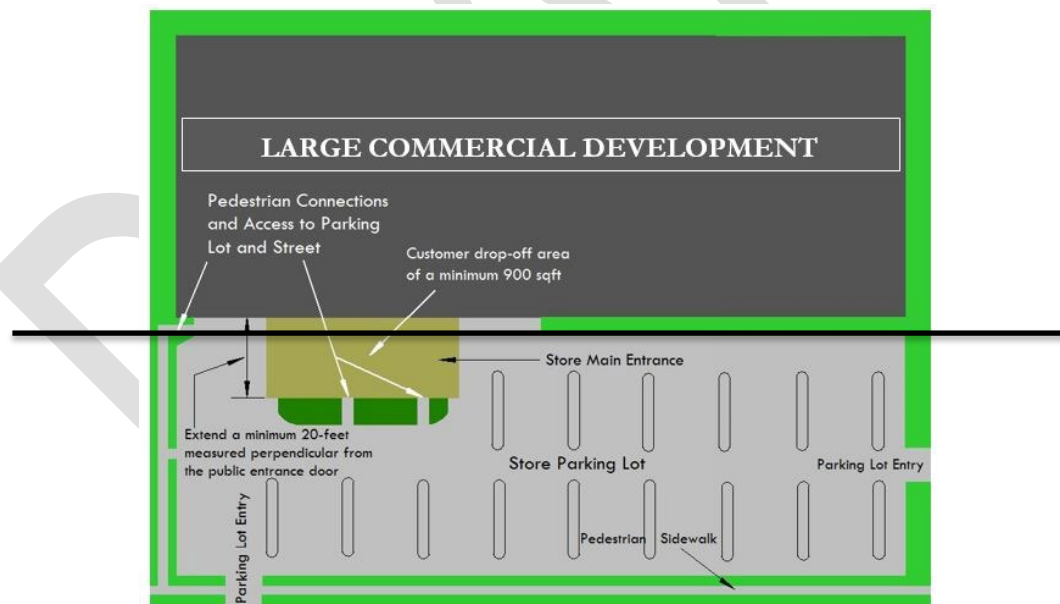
B.2: STORE BUILDING ENTRIES
